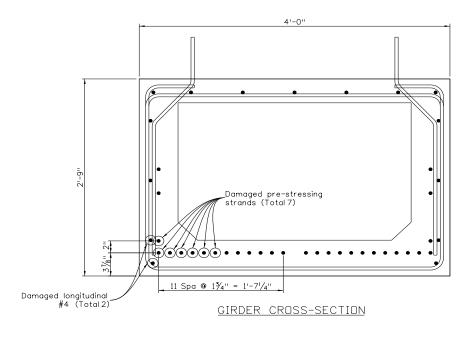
(E)-4 Sample Section of Precast Girder Repair
